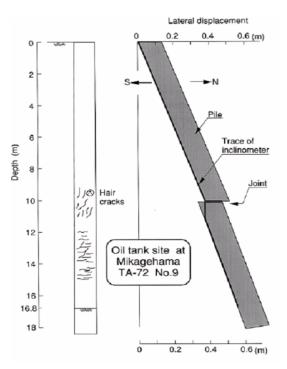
Lateral displacement and observed cracks on the inside wall of Pile No.9 Kobe 1995 EQ
